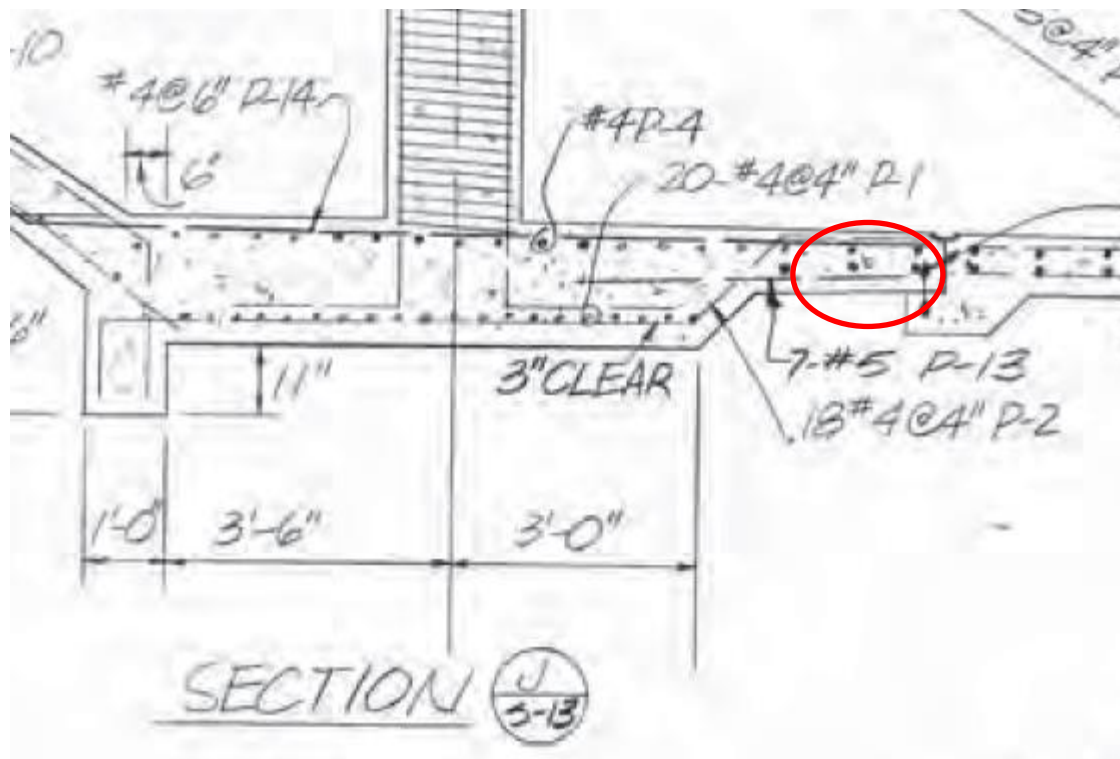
Unreinforced Expansion Joint, Drawing 10-S-14 from 1971 Drawings
